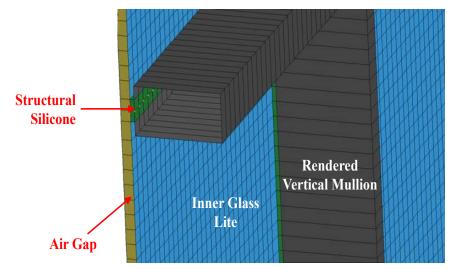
Illustration of Finite Element Details along Vertical Cross-Section through Centerline of Curtain Wall Specimen IGUs
